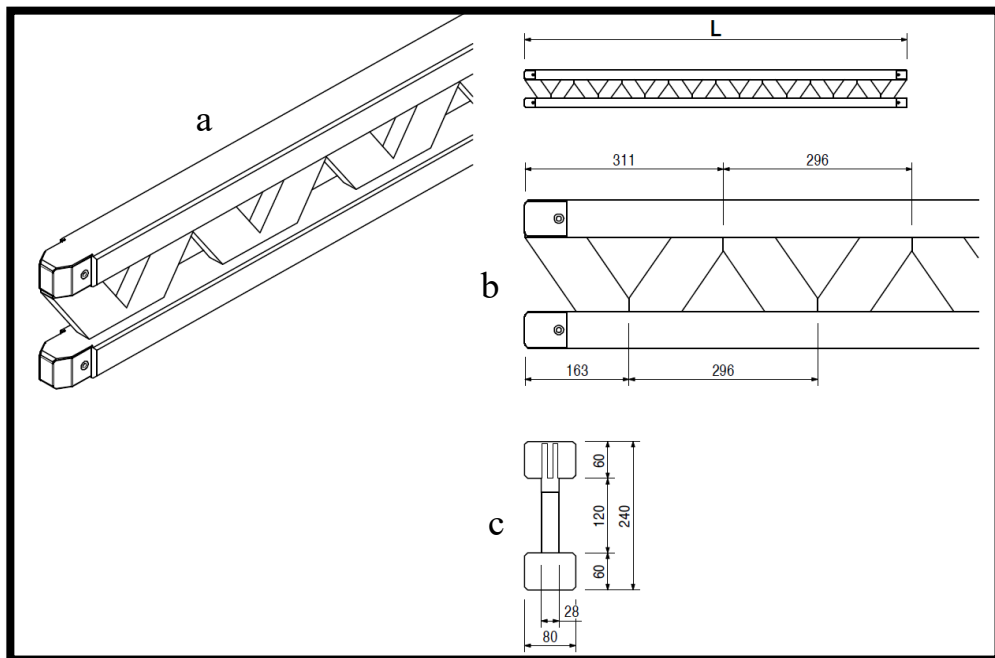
Cross-sectional Geometry Specifications (a) Isometric View , (b) Side Elevation View and (c) Cross-Sectional Front View (dimension in mm)
